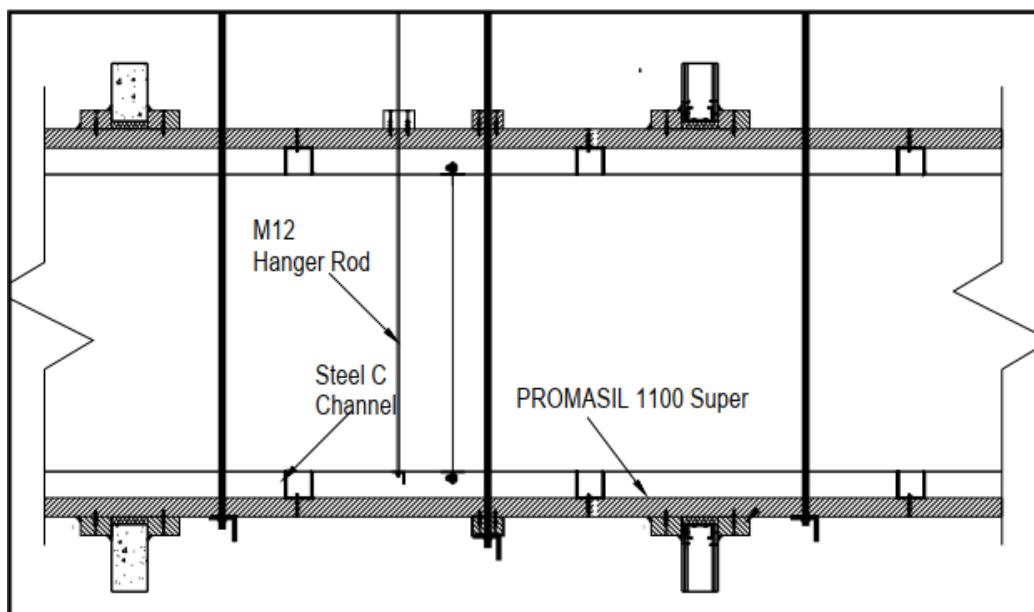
Elevation view of steel duct system through wall penetration protected with PROMASIL®1100 boards
